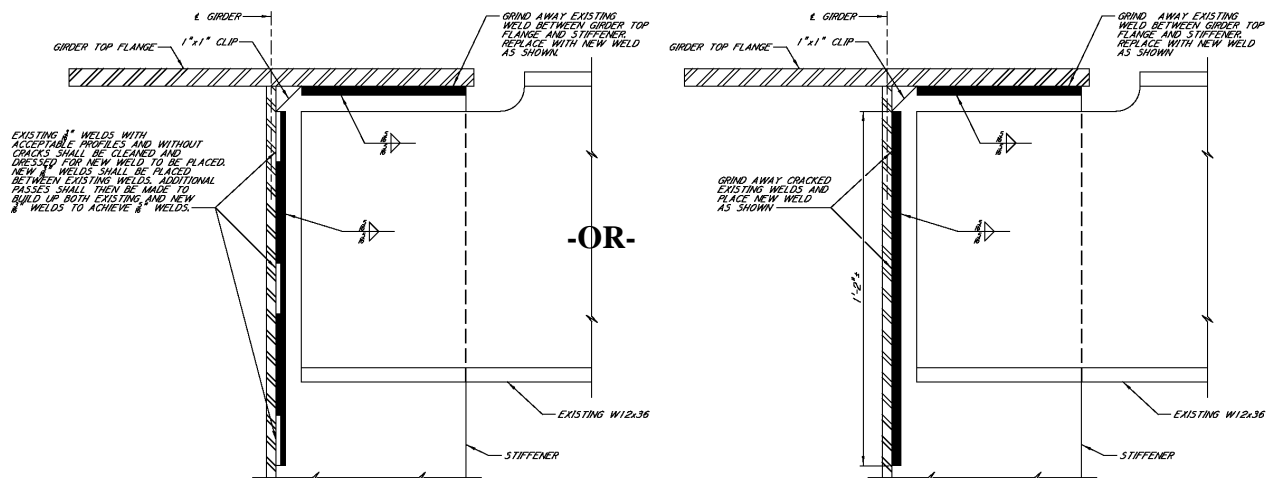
Retrofit of diaphragm connection plate to girder top flange and web
